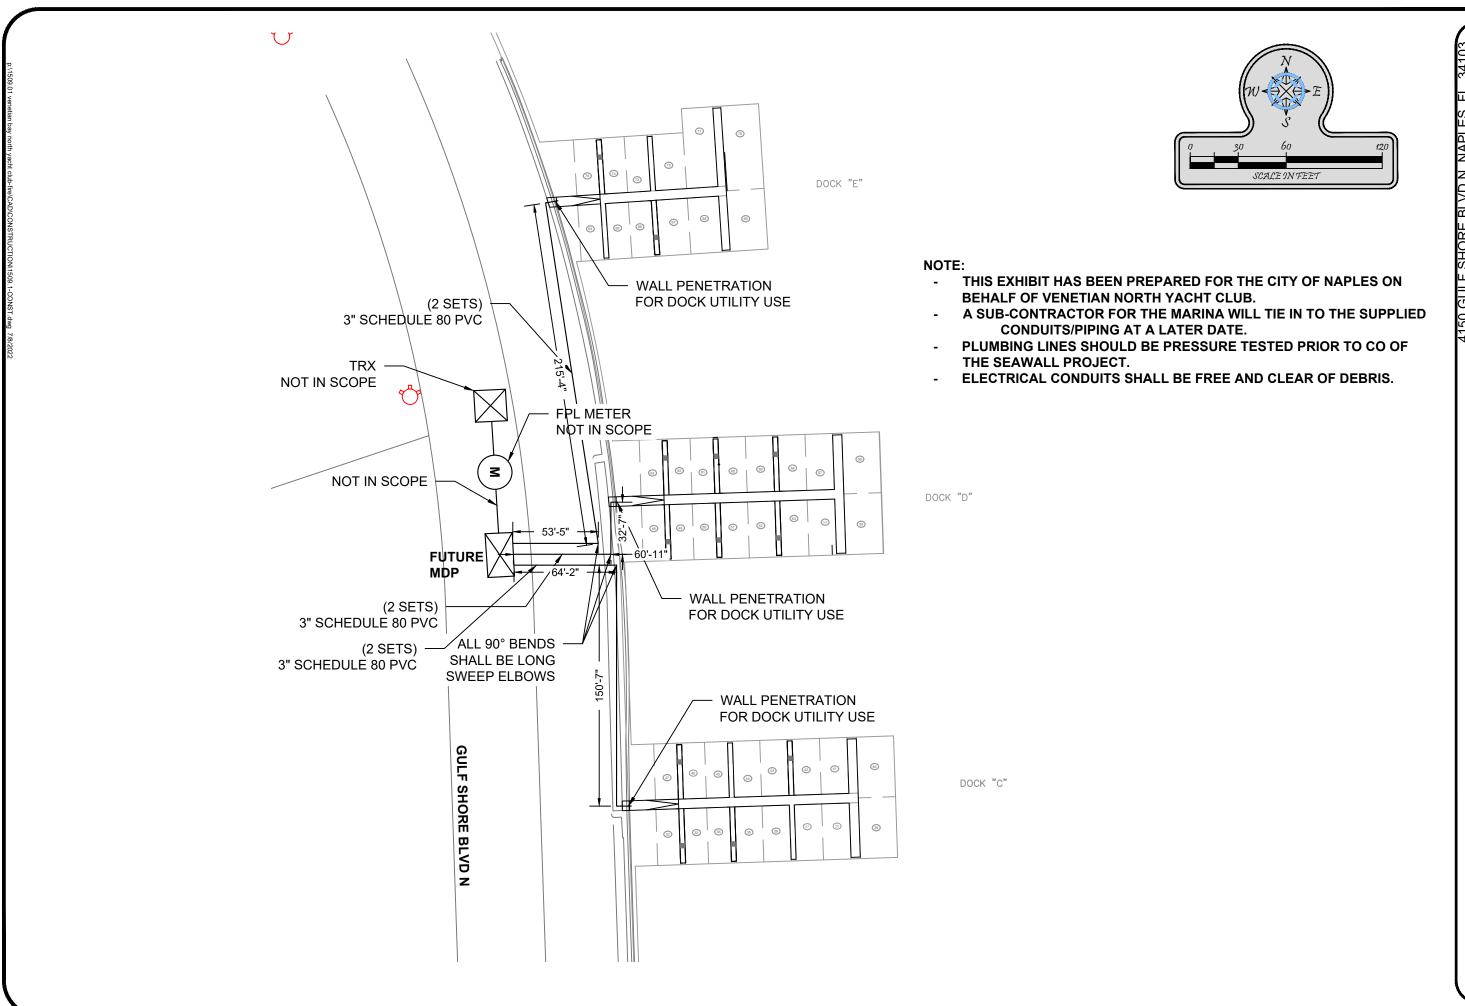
Exhibit B - Venetian Yacht Club North Electrical & Water Plan
